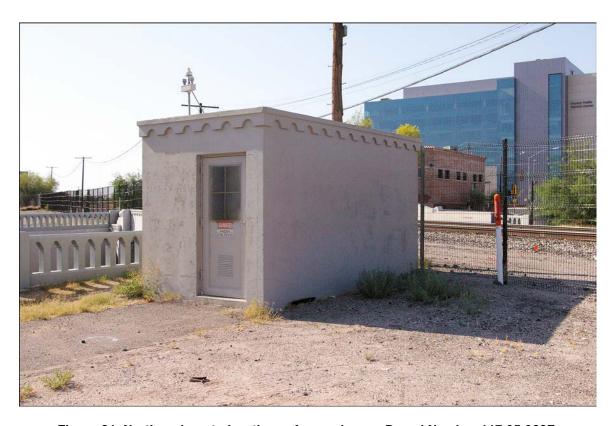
North and west elevations of pump house, Parcel Number 117-05-068F.
